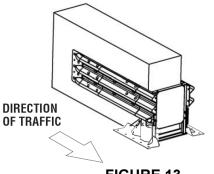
Thrie-Beam End Shoe Connection Panel
